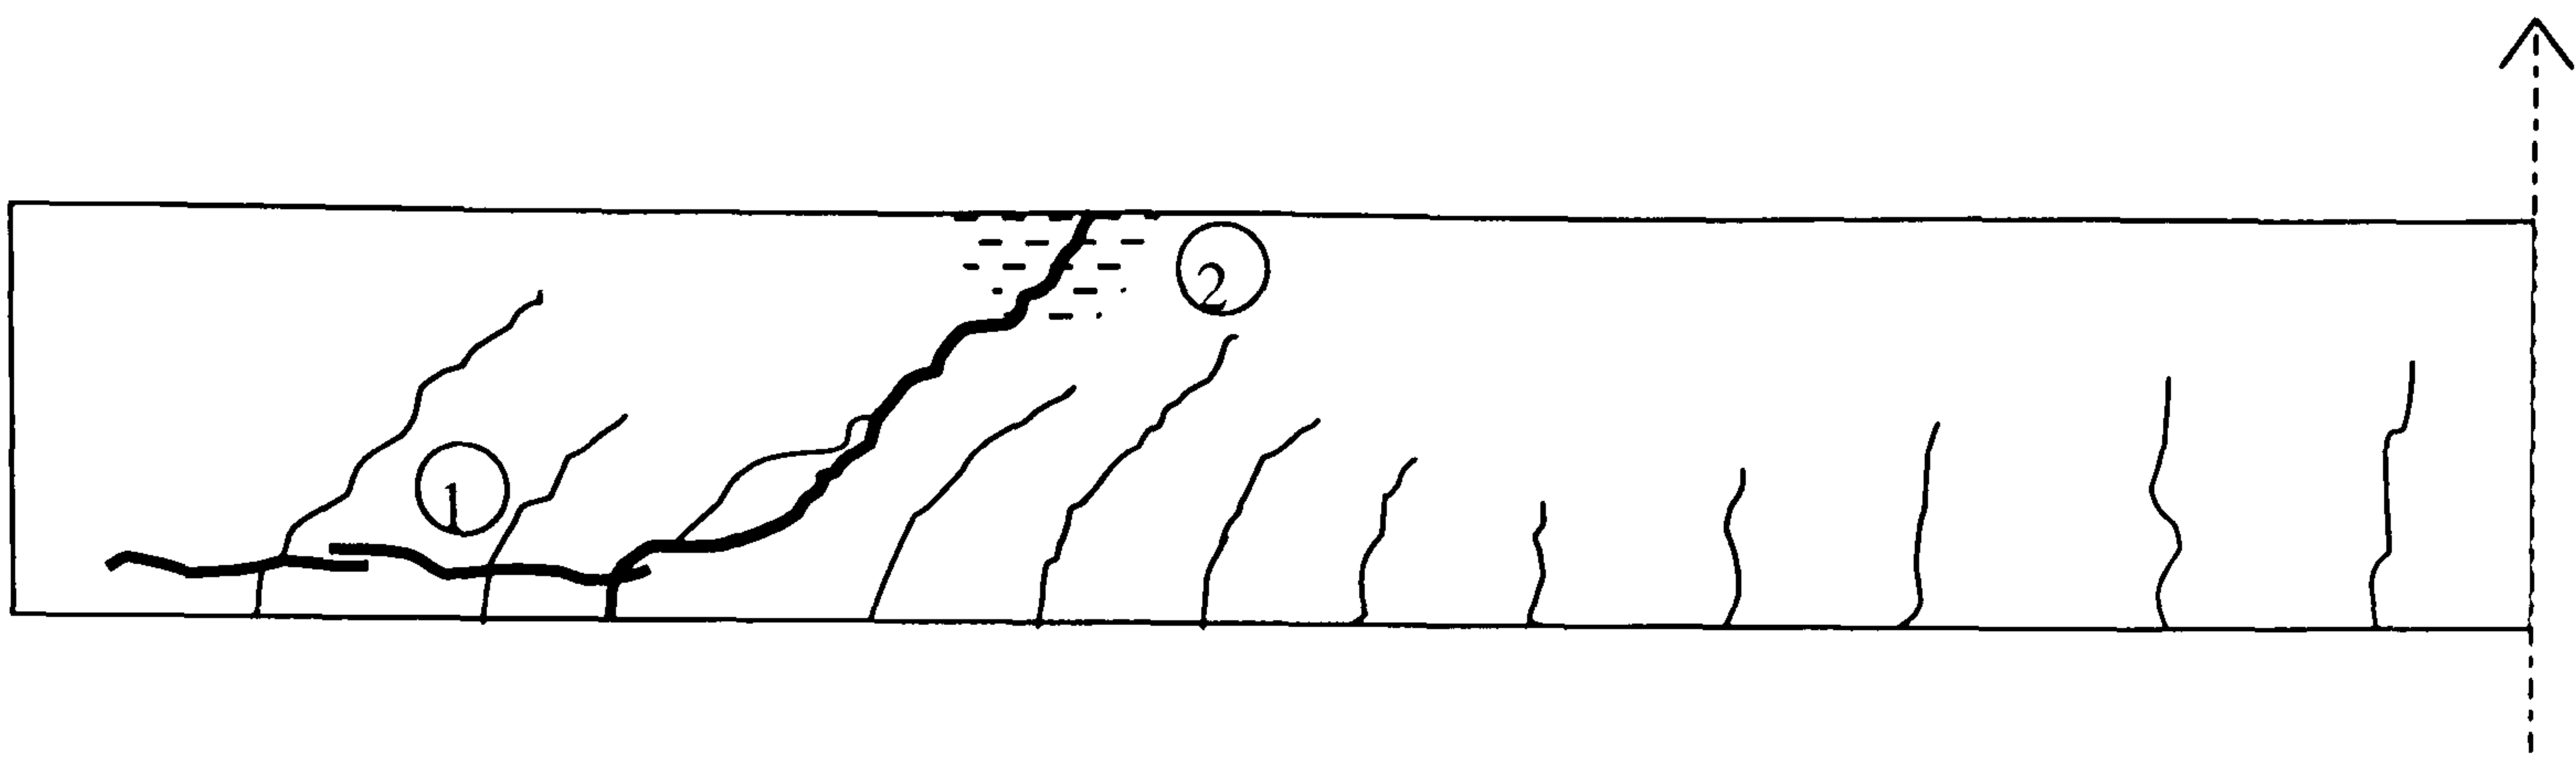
Cracking pattern of a reinforced concrete beam failing in flexural shear
